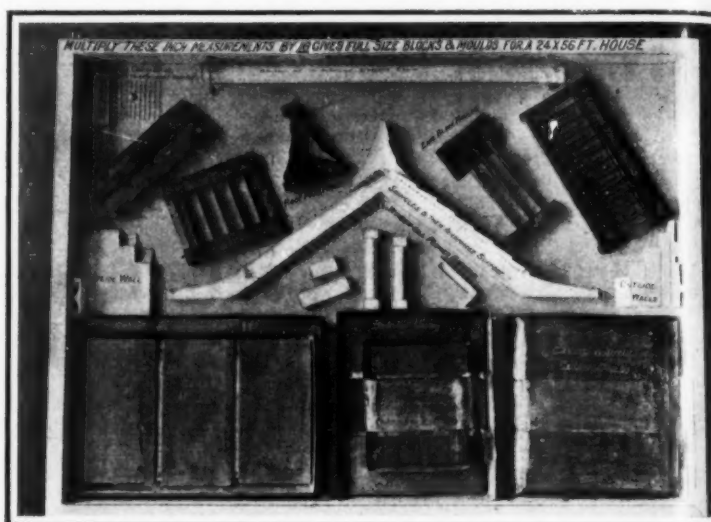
THE MOLDS, BOTH CEILING AND BLOCK MOLDS, WITH FORM OF ROOF AND REINFORCED FLOOR CONSTRUCTION USED IN BUILDING THIS MODEL.
